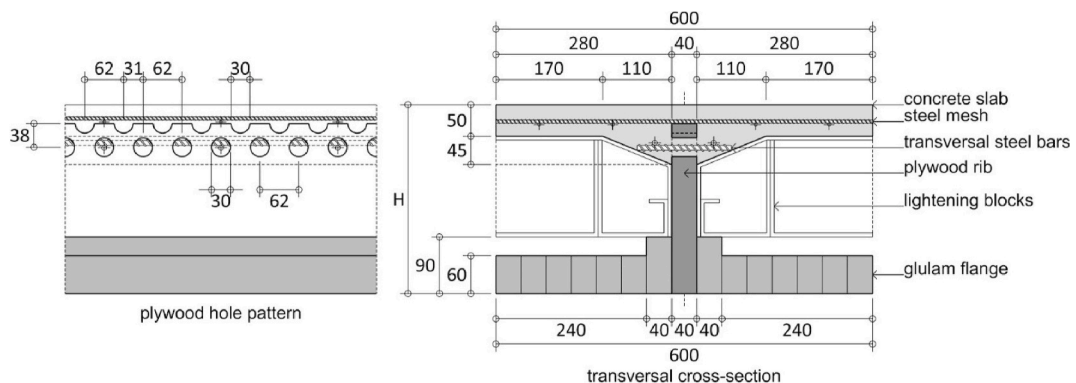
Geometric parameters of the test specimen. Dimensions in mm.
